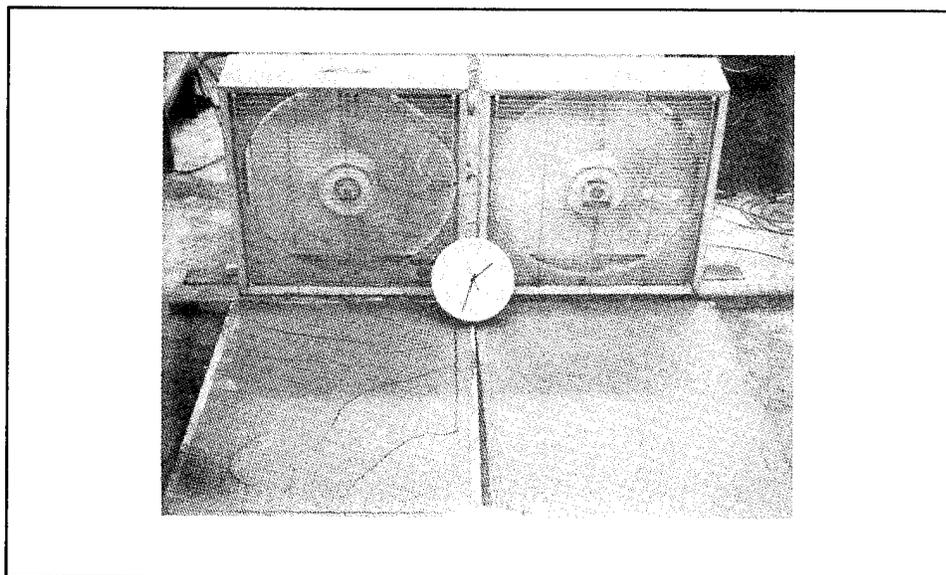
Test specimens after 2-1/2 hr of testing (Kraai 1985)
